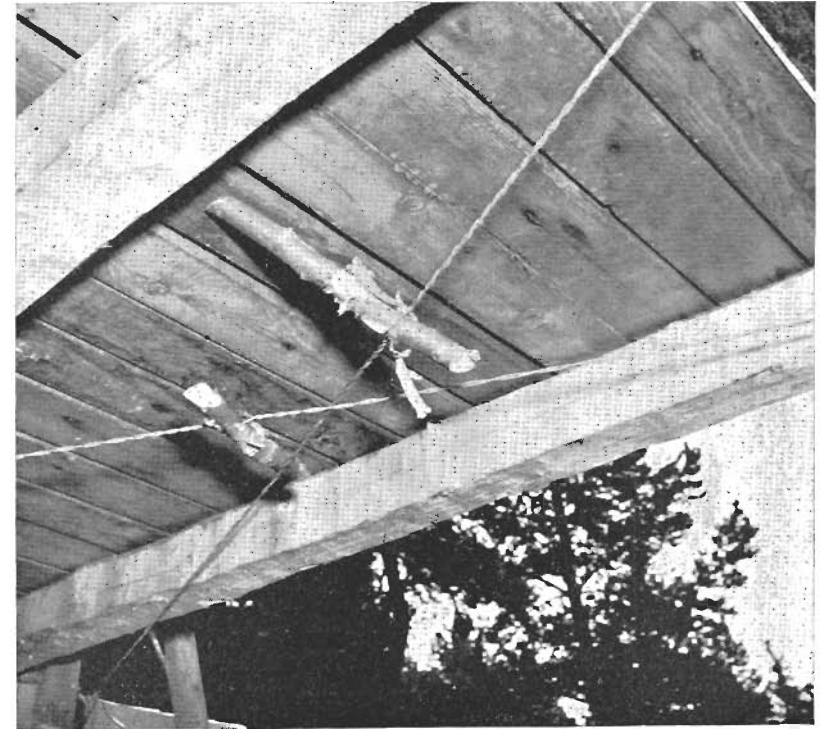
Wire sway bracing of suspension footbridge. Rack sticks twist wires tight; they are held in place by locking them against floor plank.
